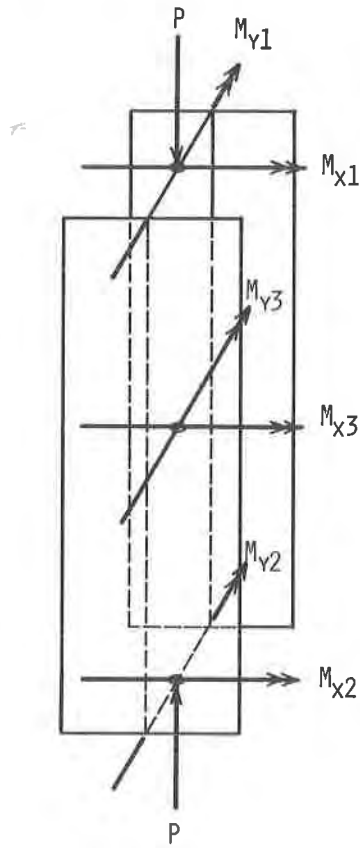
A TYPICAL BEAM COLUMN ELEMENT
